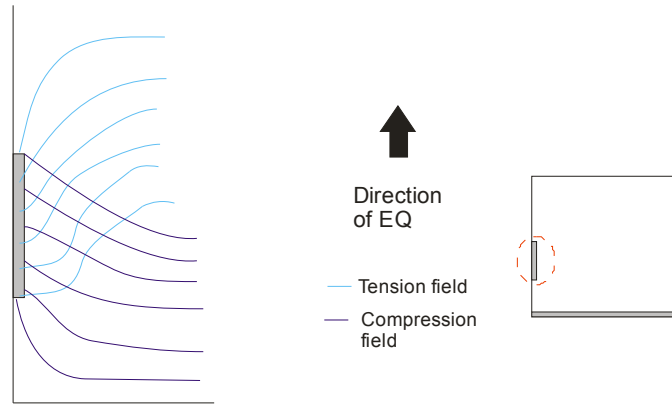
Compression and tension field at the 7m wall for floor layout 4
